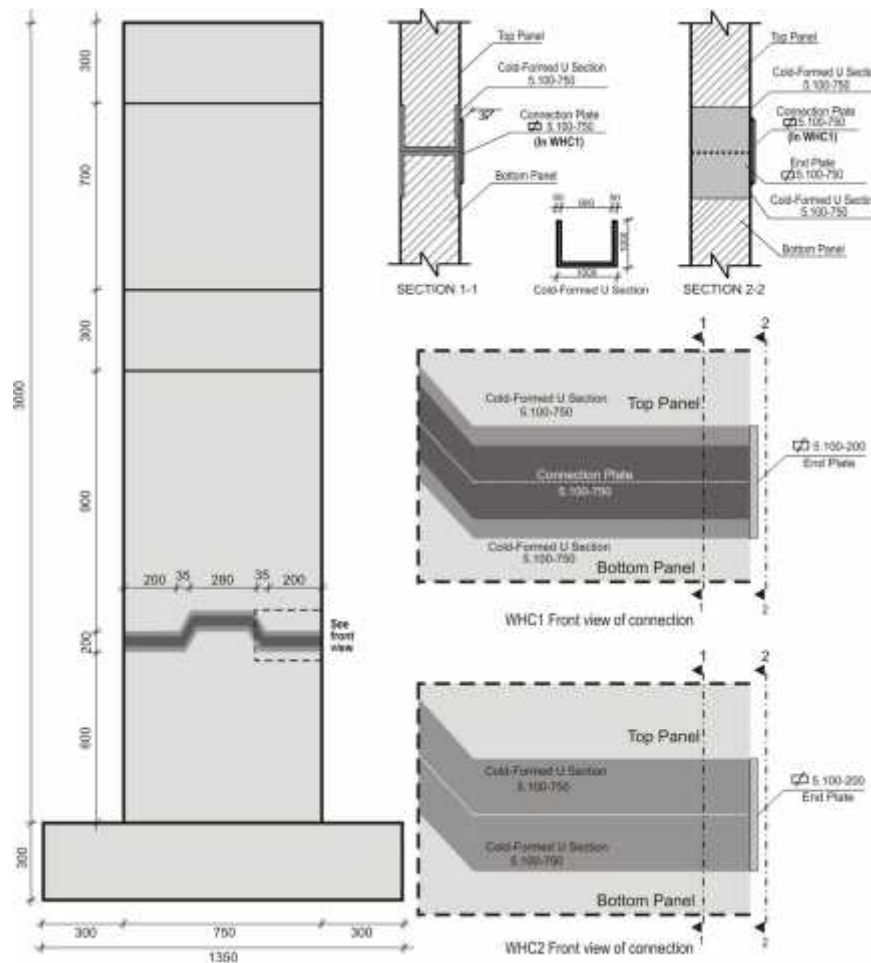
Schematic view of WHC1 and WHC2 models and connection details.
